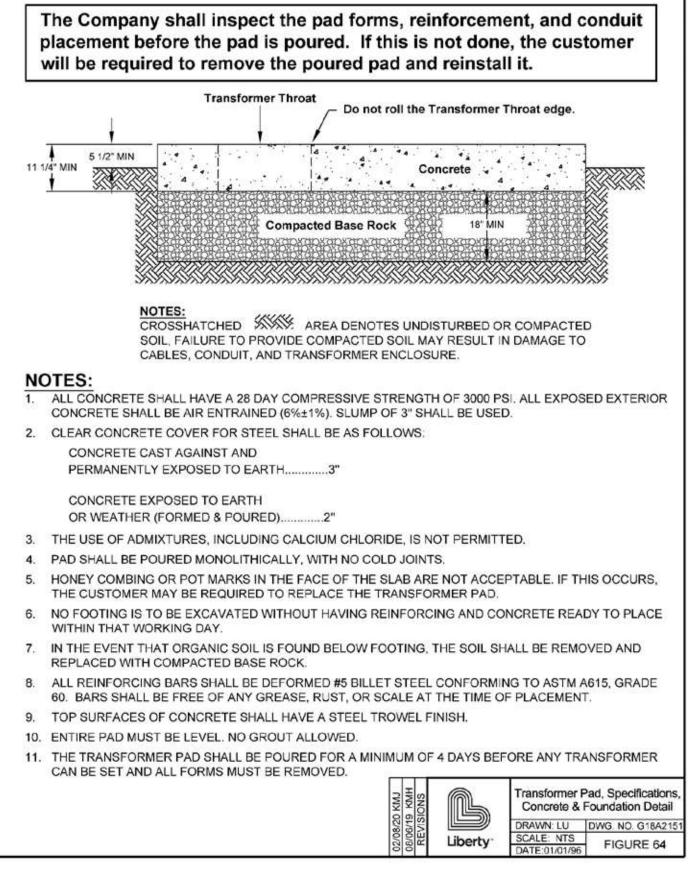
Transformer Pad, Specifications, Concrete & Foundation Detail
